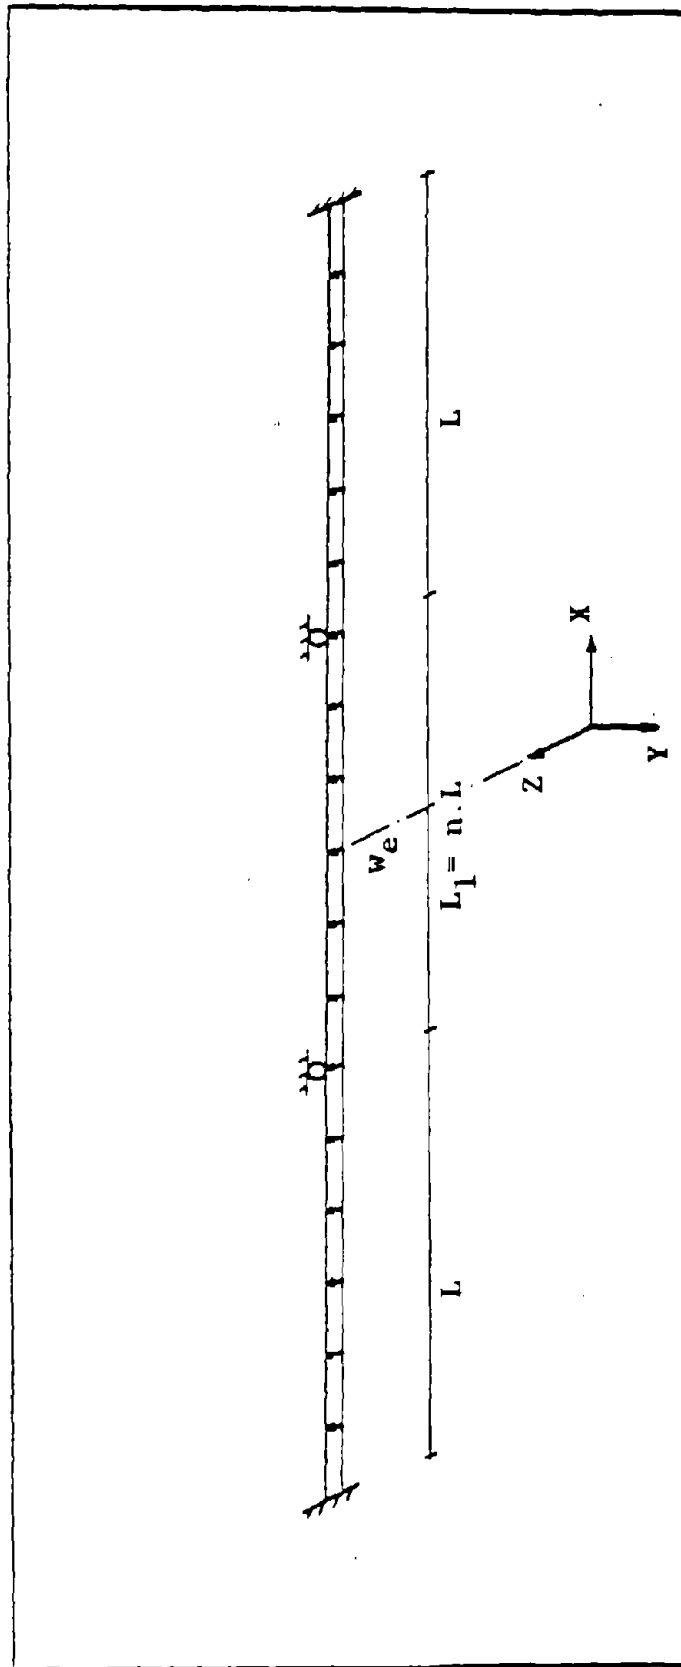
Equivalent Static Load w_e For a 3-Span Bridge
